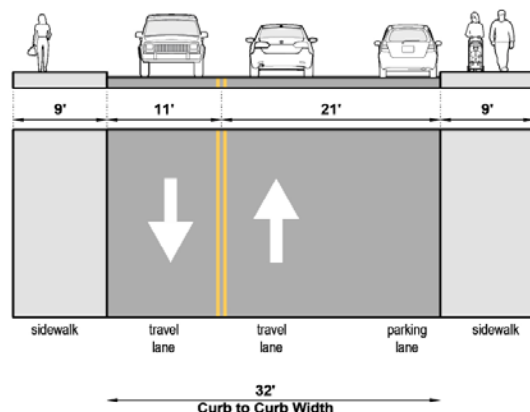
Existing conditions on 9th Street between Jackson Street and the I-94 Bridge.
